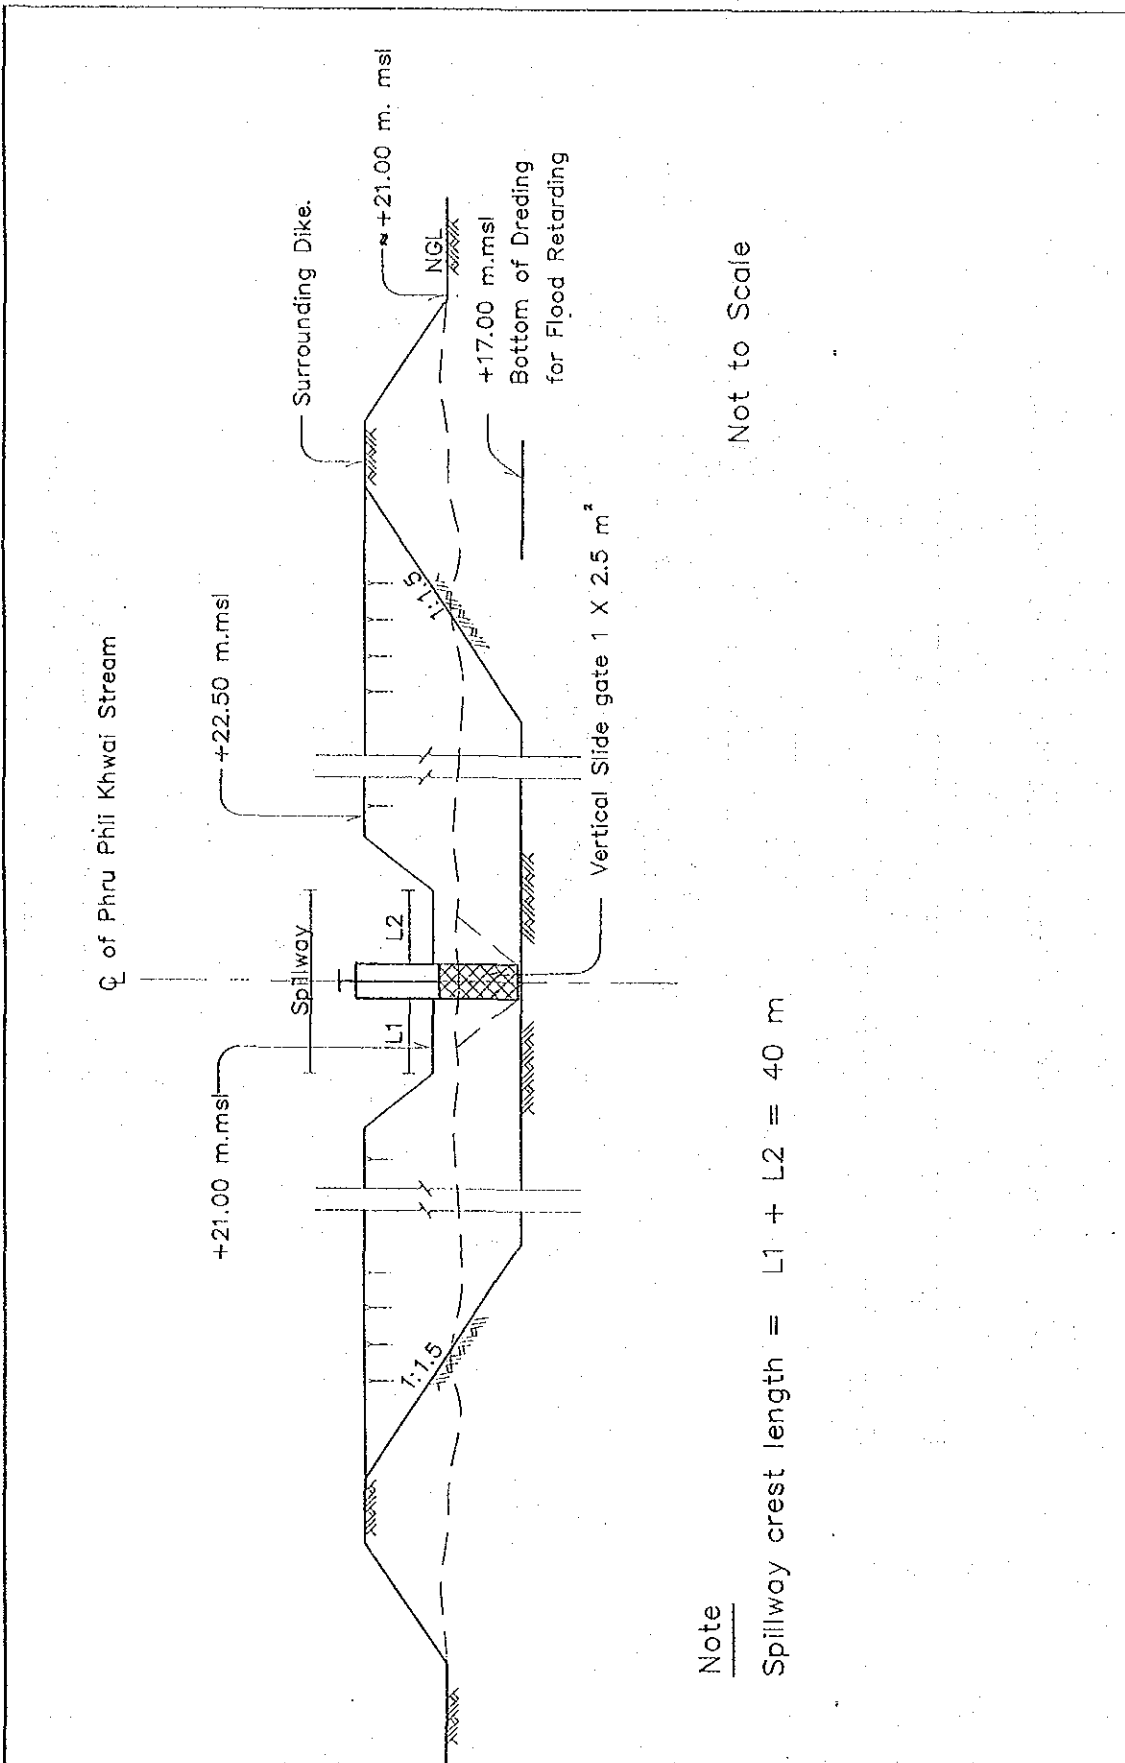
Conceptual view of Phru Phli Khwai Cross Section and Outlet Structure.(looking downstream)
